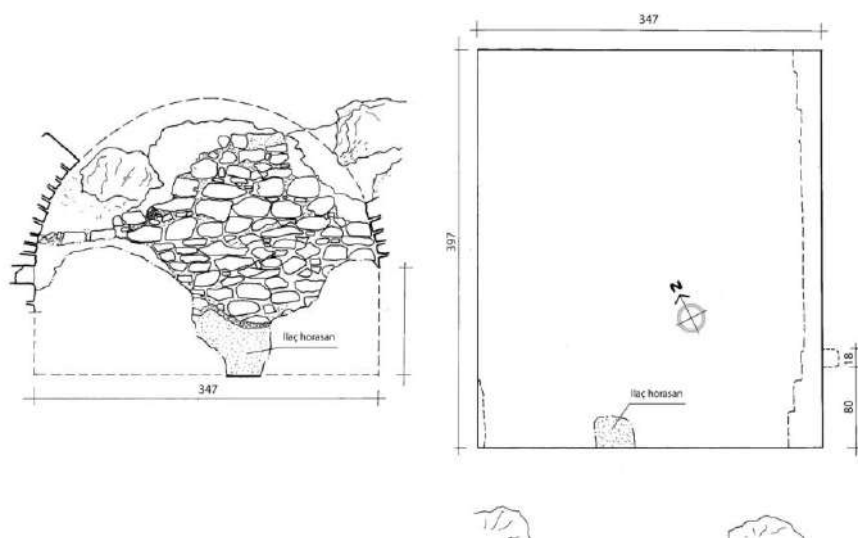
Plan design of the northern wall of Scanderbeg's tower
